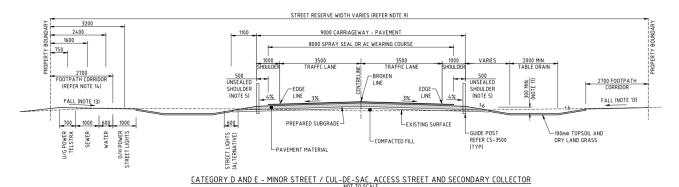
Typical Rural Road Cross Section as indicated by NTG standard drawing SS1005
